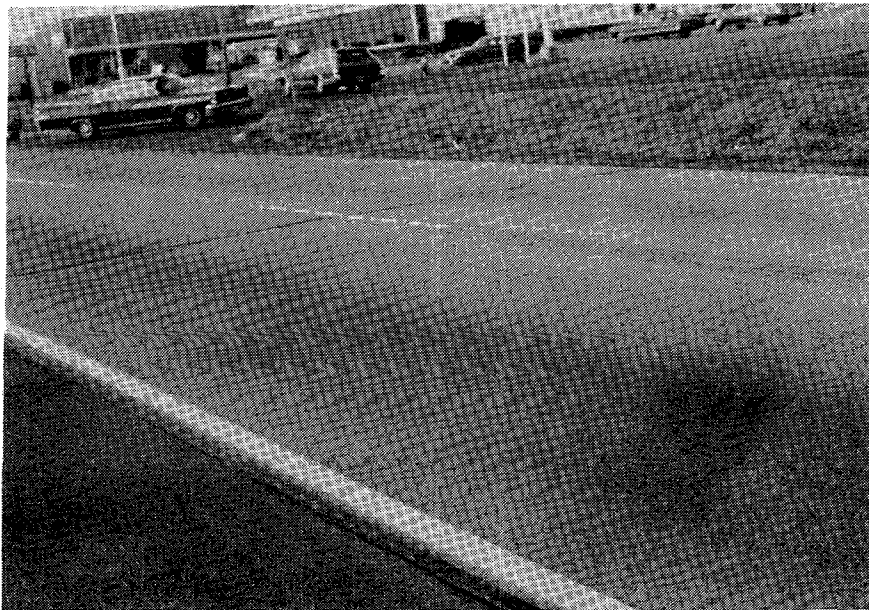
JRCP-5, Jointed Reinforced Concrete Pavement.
